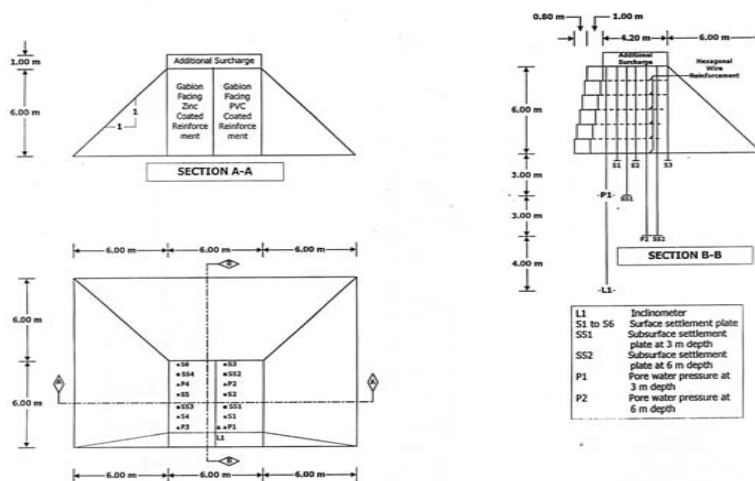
Schematic plan view layout of field instrumentation (Voottipruex, 2000)
